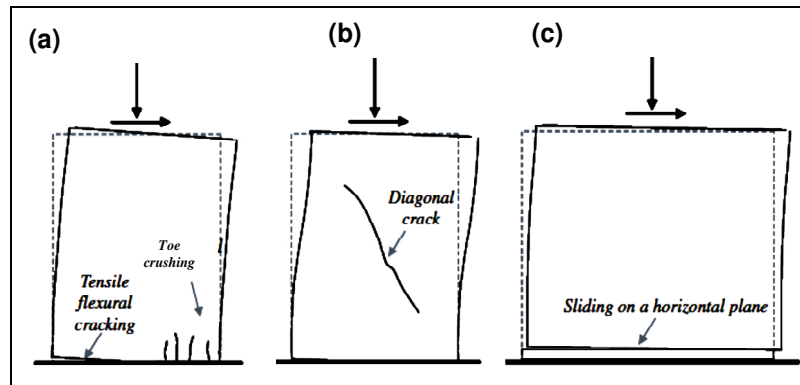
In-plane failure mechanisms of masonry walls: (a) flexural failure, (b) diagonal shear failure and (c) sliding shear failure
